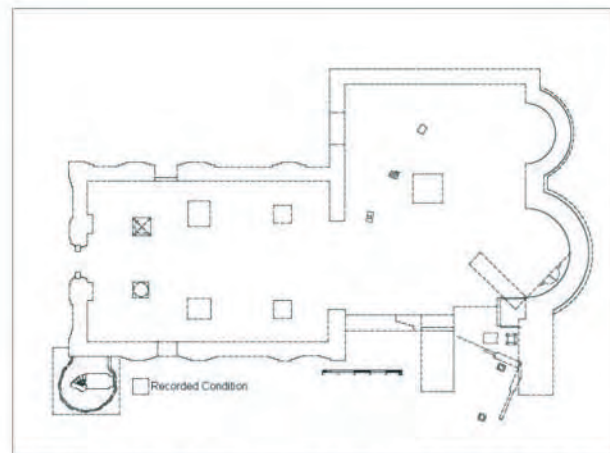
Planimetric plan of the foundations of the Cathedral excavated in 1954. The plan published in Zdravković (1956; 1958) has been redrawn with AutoCAD by Arch. B. Keka.
